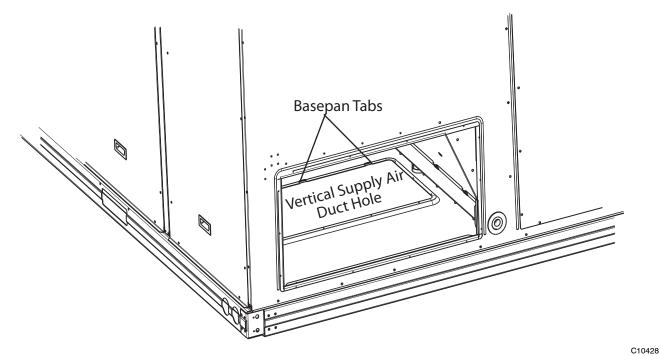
View Through Horizontal Supply Air Duct Hole with Cover Removed
